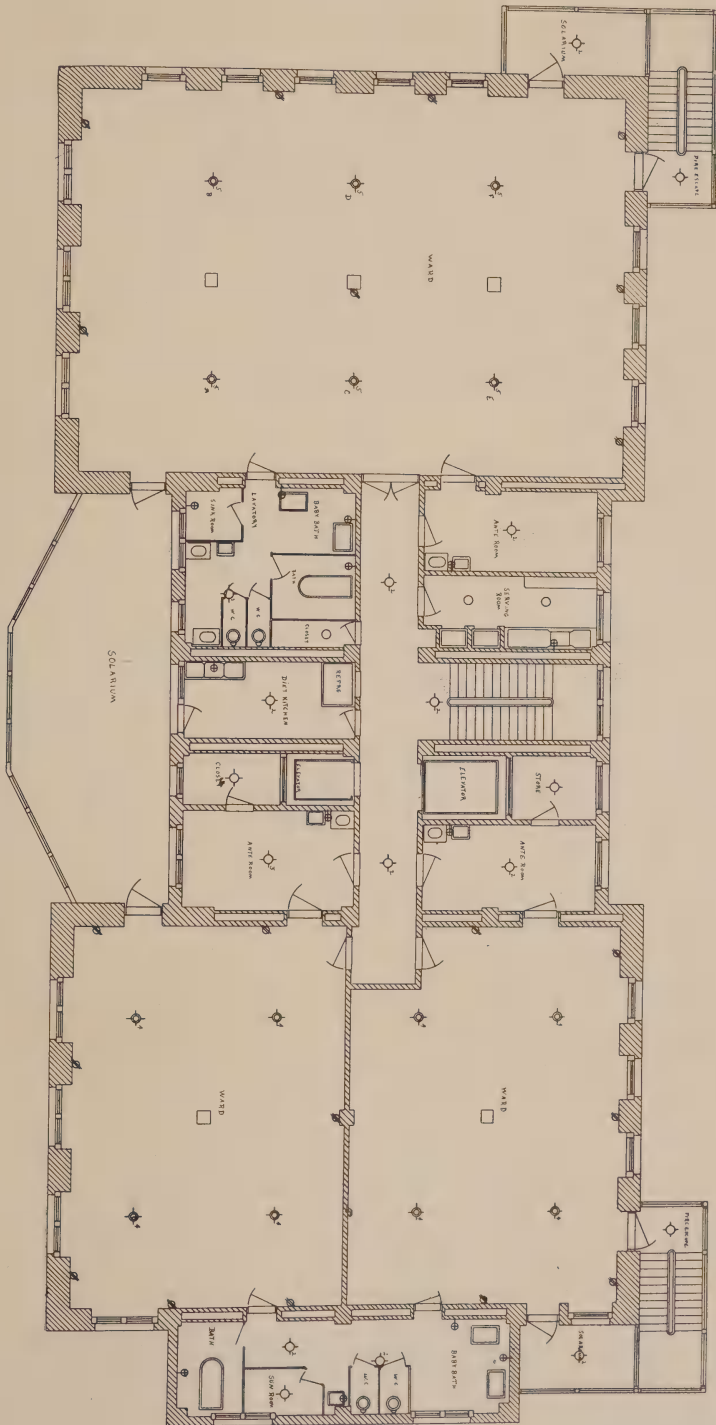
FLOOR PLAN, WILLARD PARKER HOSPITAL.
